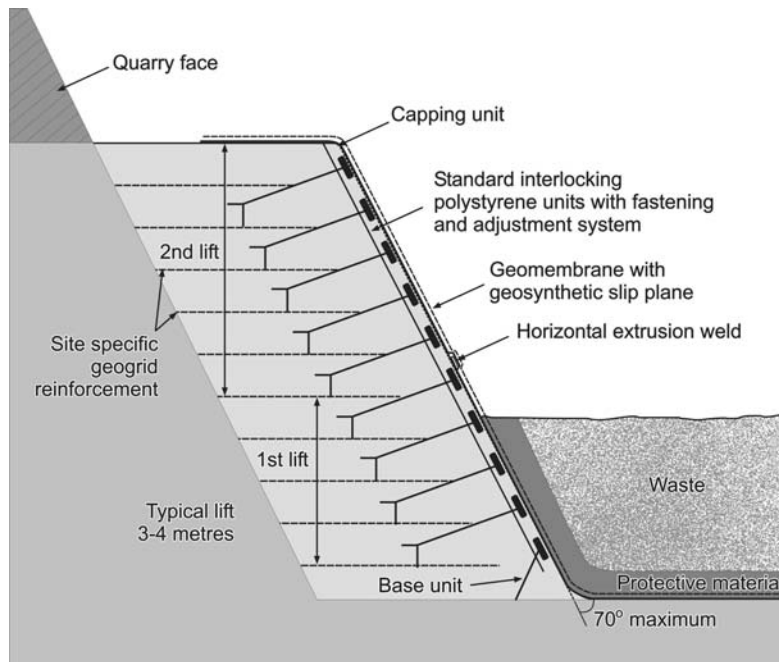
Cross-section through a typical reinforced soil supported lining system
